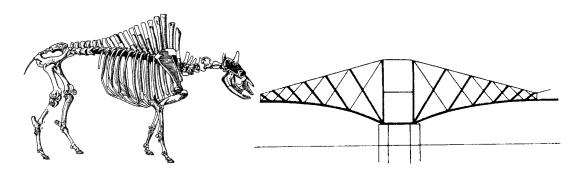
(a) Skeleton of fossil bison, (b) two-armed cantilever of Forth Bridge
